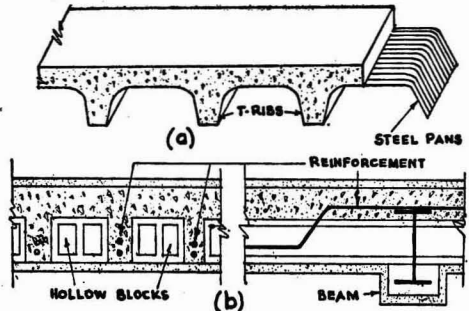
Ribbed floor with (a) steel tiles and (b) hollow clay blocks
